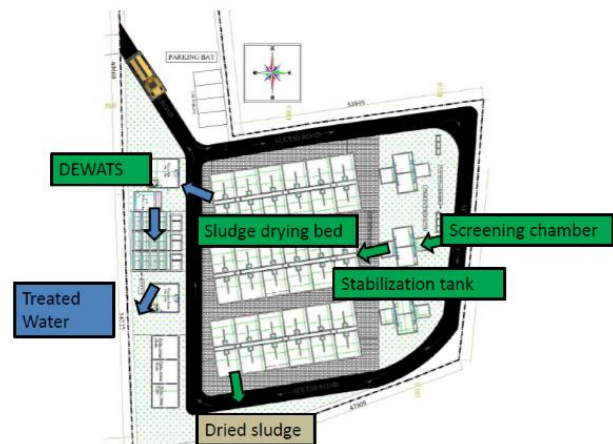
Layout of fecal sludge treatment plant in Dhenkanal (Source: Arghyam)
